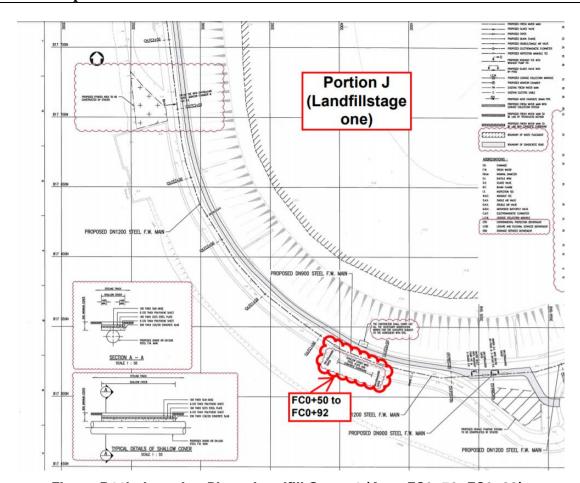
Location Plan – Landfill Stage 1 (Area FC0+50 -FC0+92)
